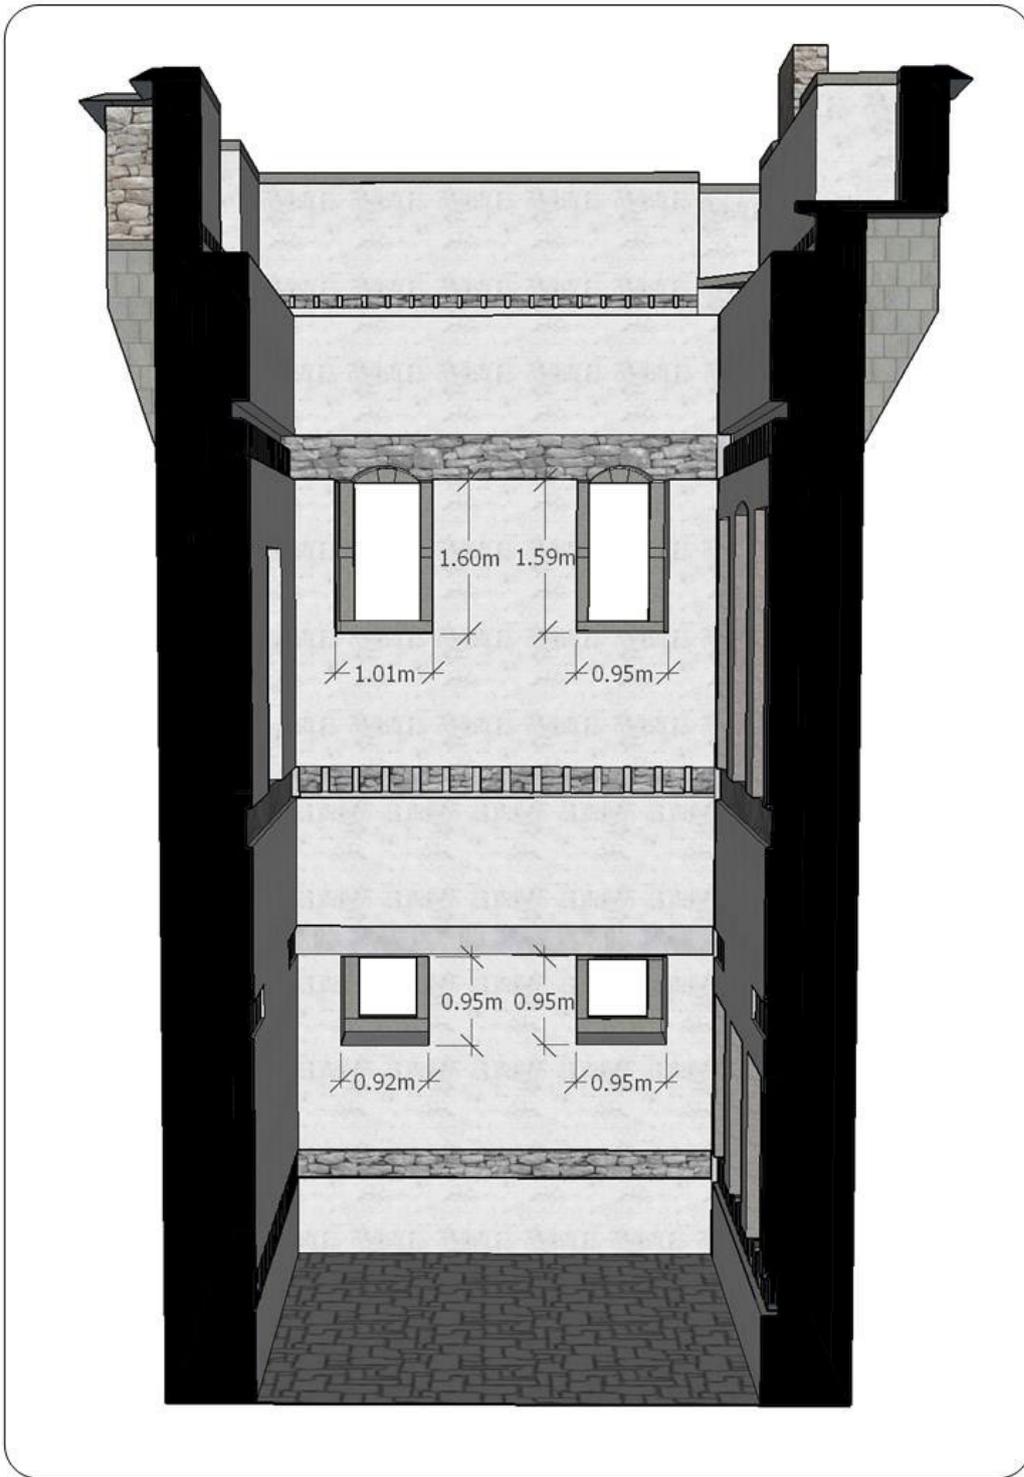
Cut away view of 3D model for an idealised tower showing interior face of side wall, windows and entry to bartizan at top right.
